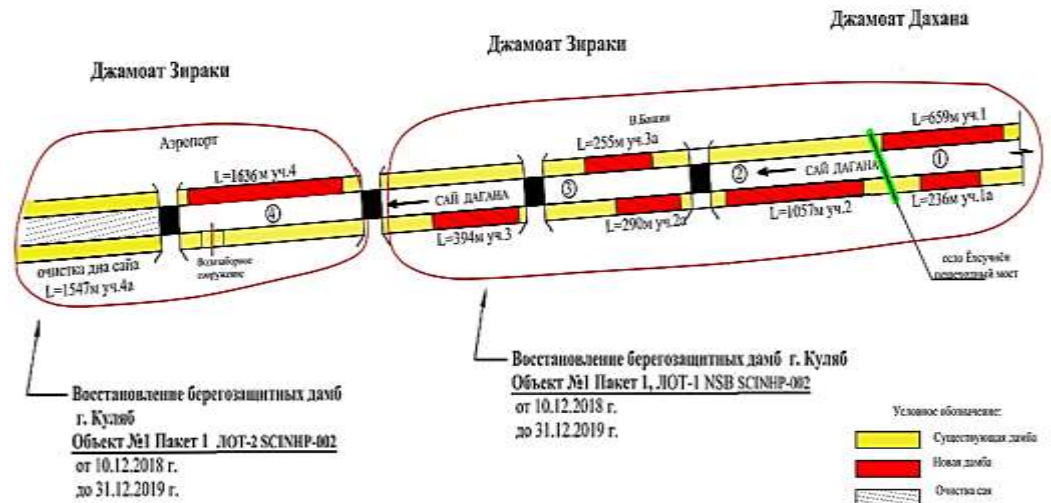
Layout of the Site №1. Section Dahana sai, Kulyab city
